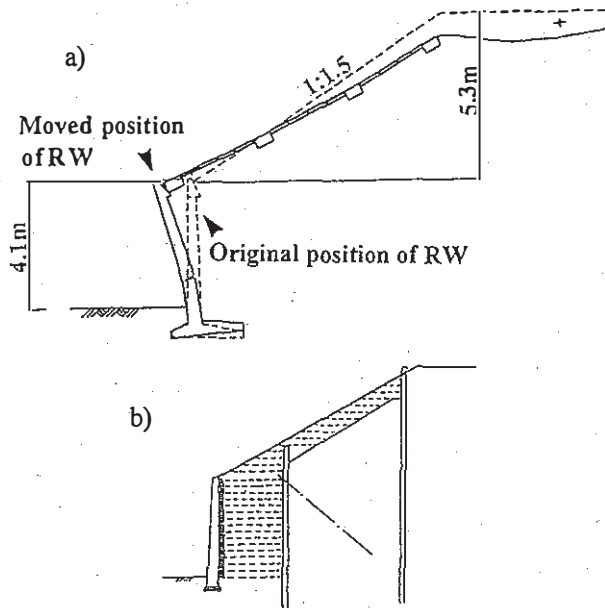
Cross-sections of a) a typical damaged cantilever-type RC RW without a pile foundation (CL2 in Fig. 4) and b) a GRS-RW by reconstruction, at Shin-nagata Station, JR Sanyo Line.
